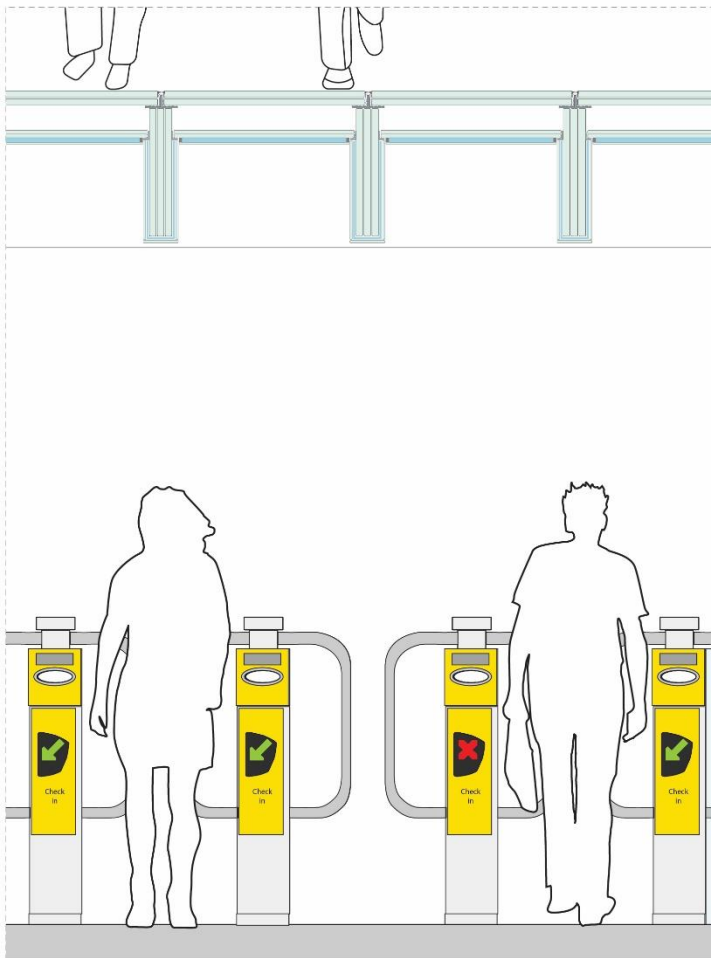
Cross section showing the proposed glass beams above the check-in gates of the NS
